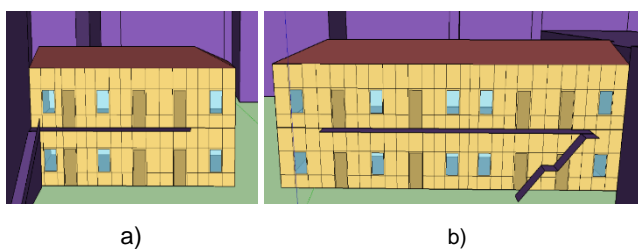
Representation of the division of the façades: a) Building 2; and b) Building 3.
